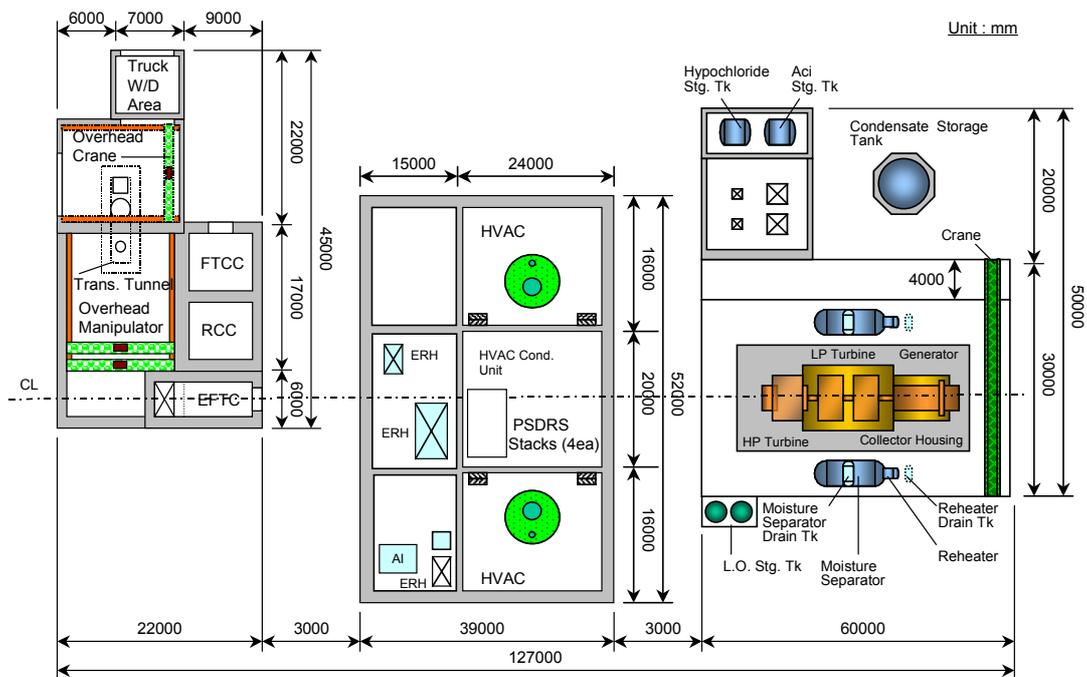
Plan view of the fuel handling and storage building, reactor building, and turbine generator building.
